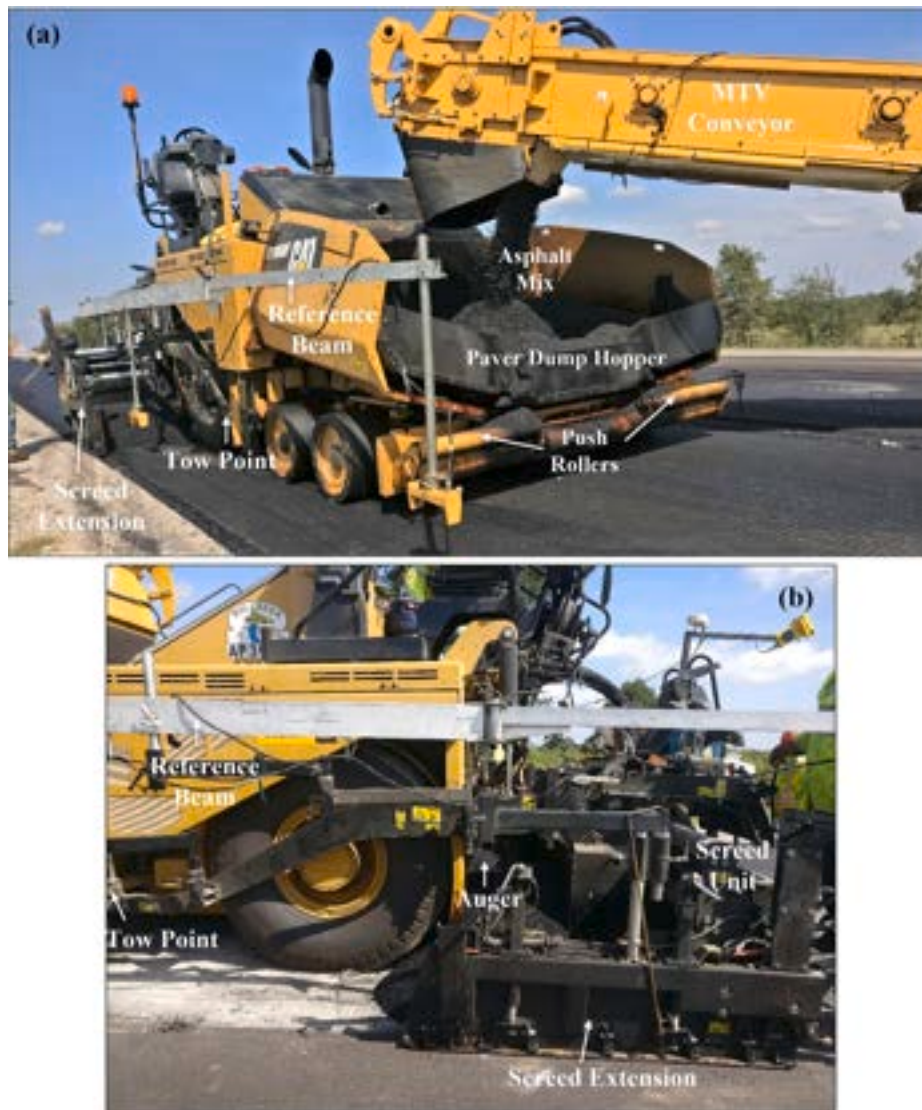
Asphalt paver used in overlay construction: (a) overall view; and (b) side view.
